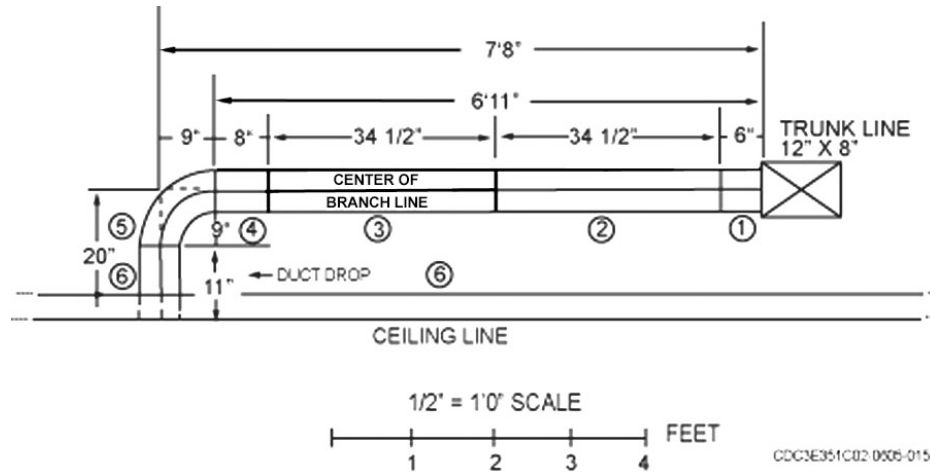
Elevation view of 6-inch branch line used in rooms 1, 7, 8, and 13.
